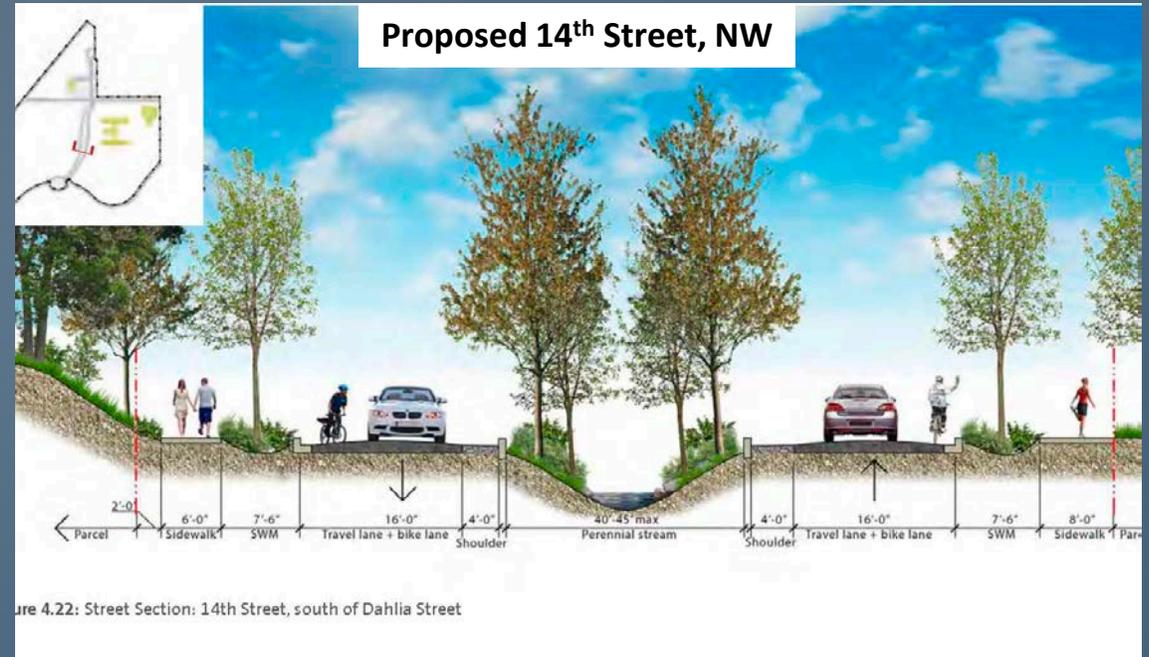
Street Section: 14th Street, south of Dahlia Street
